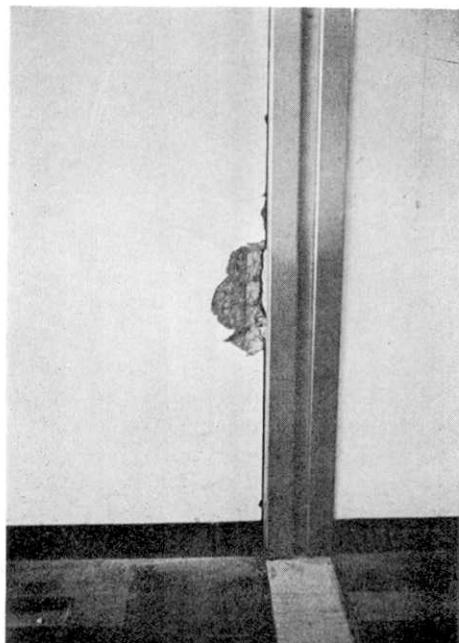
Damage to expansion joint (Nishi Elementary School, Ito city)
